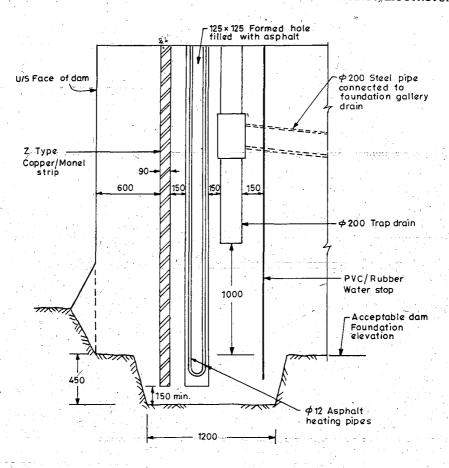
Typical waterstop details near the top of non-overflow section of a dam.
